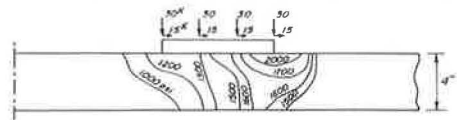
Fracture sequence in asphalt concrete surfacing, flexible support (68 F).
